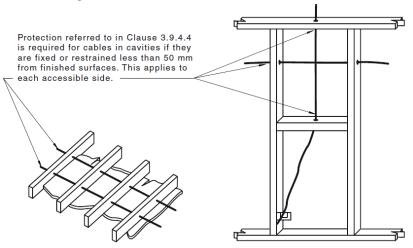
PROTECTION OF WIRING SYSTEMS WITHIN CEILINGS, FLOORS AND WALL SPACES
